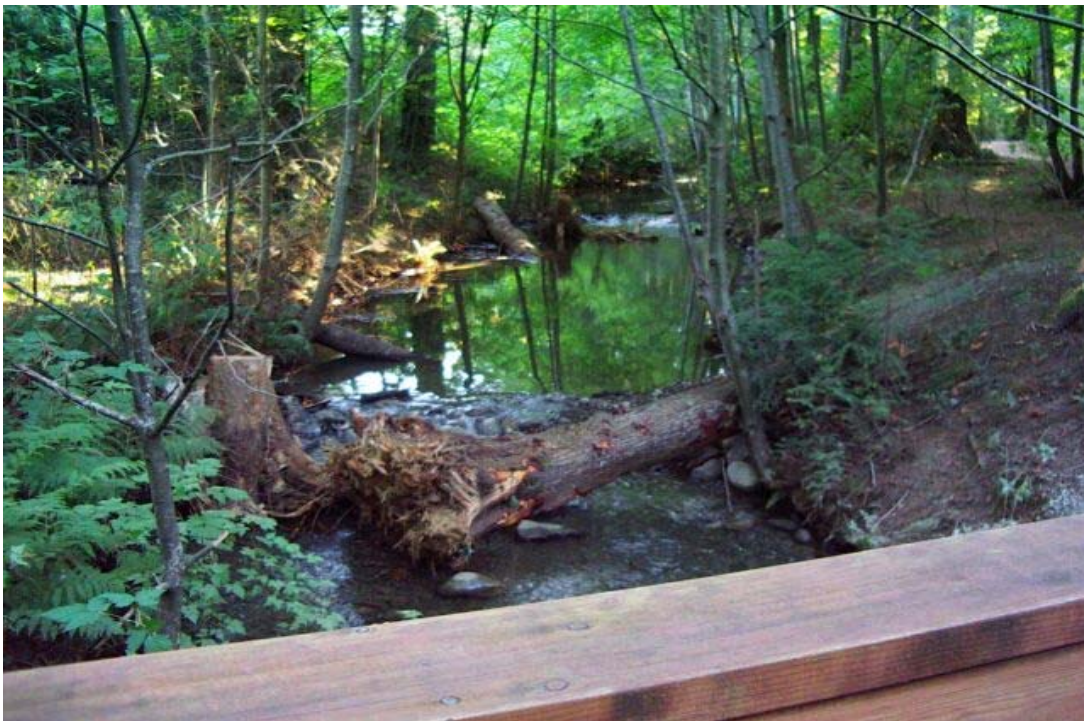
Post-construction view of Jack Hames Channel from 0+290 m at a riffle sequence and LWD replacing the concrete weir (September 2003).
